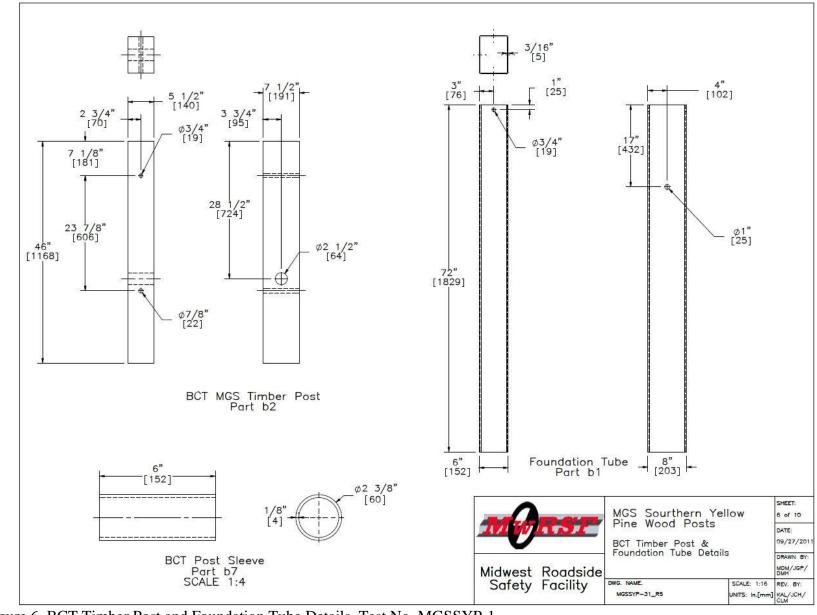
BCT Timber Post and Foundation Tube Details, Test No. MGSSYP-1
